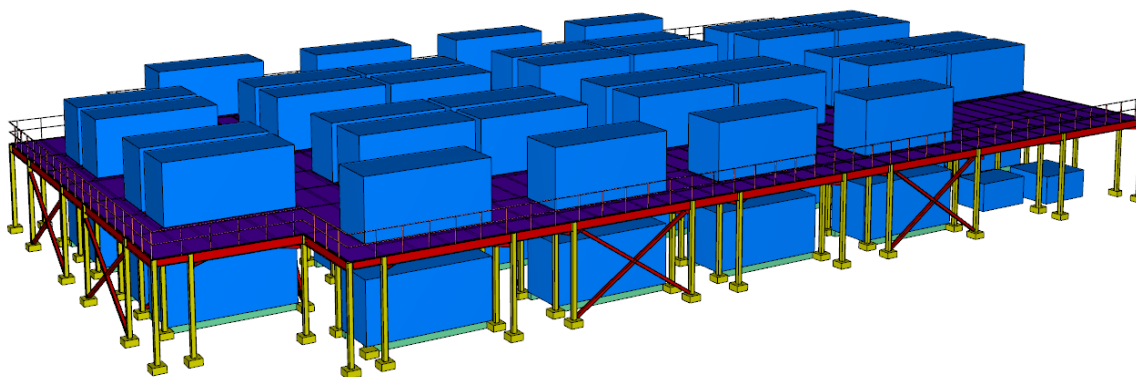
CAD drawing of Trimount Energy Storage double stack site arrangement
